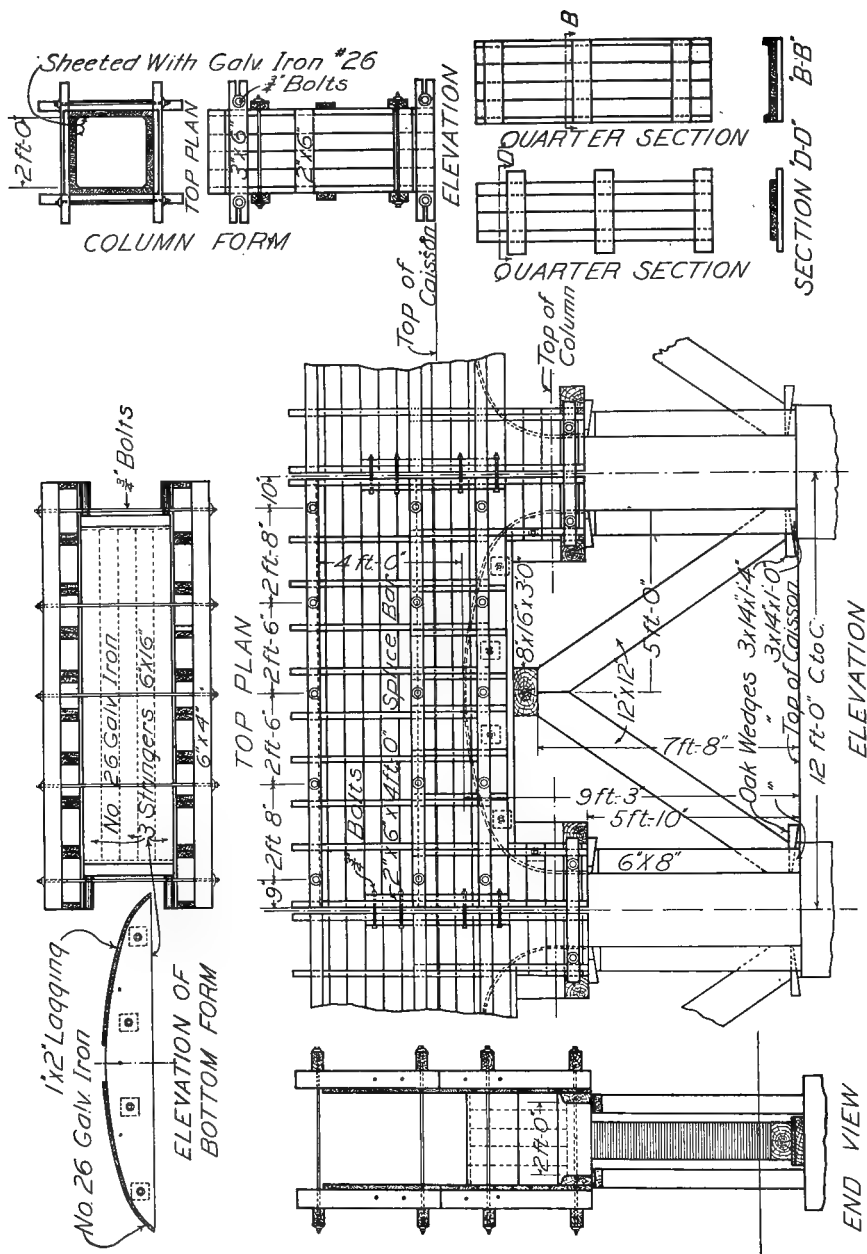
FORMS FOR COLUMNS AND GIRDERS, C., B. & Q. R. R. TRACK ELEVATION.
